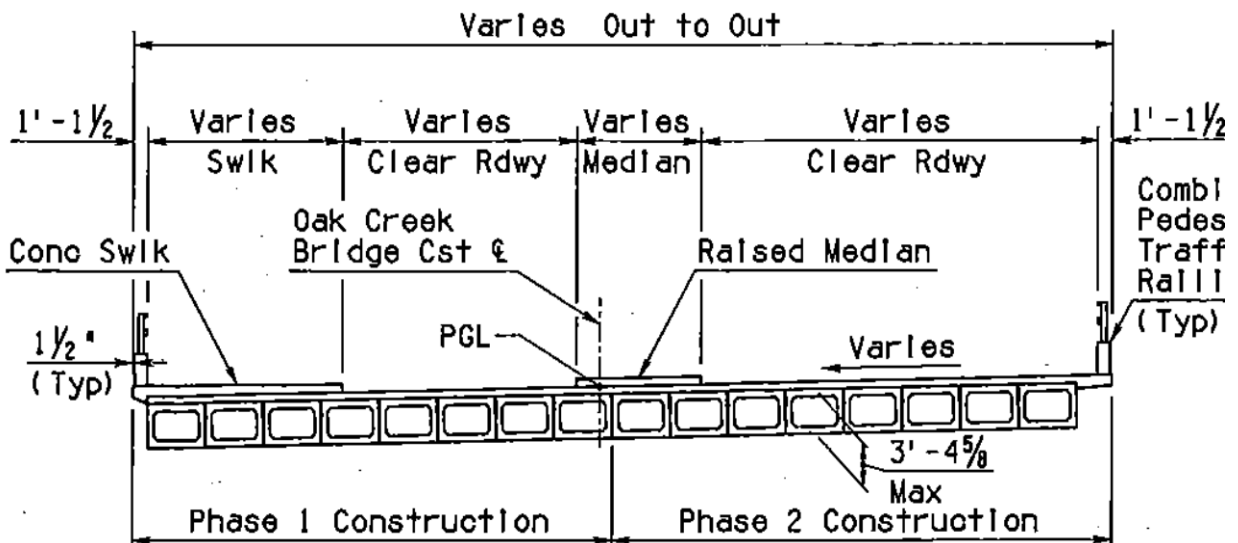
New Oak Creek Bridge typical sections (spans 2 and 3).
